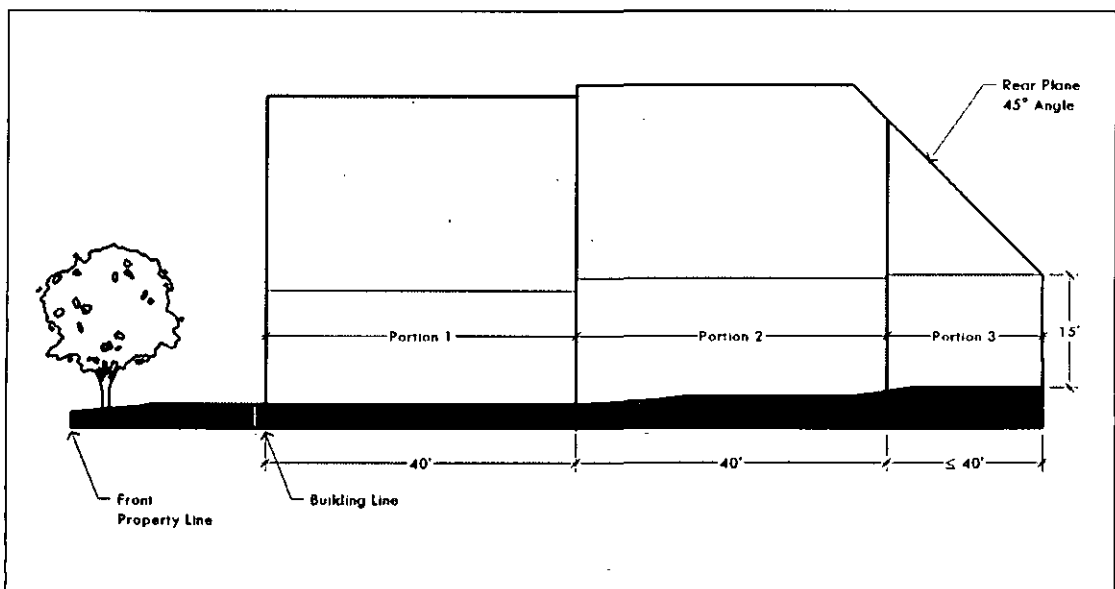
(Elevation View) Rear Setback Plane (Sloping Ground)
